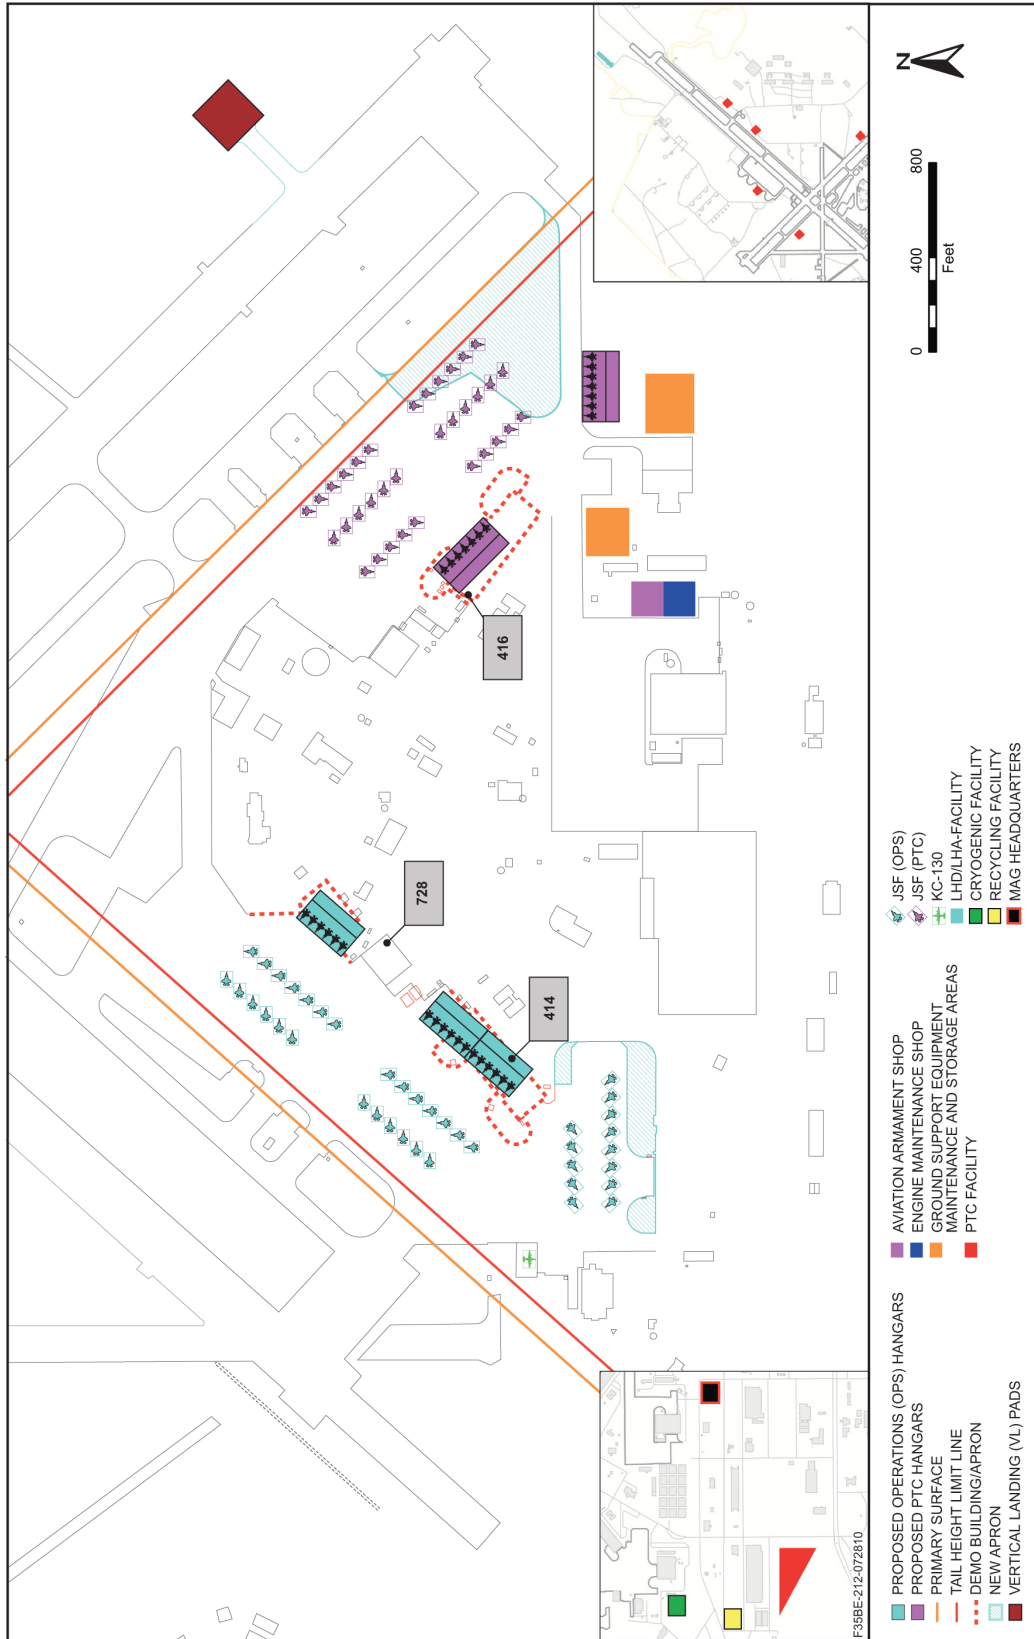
provides the site layouts for proposed new airfield-associated construction and demolition activities as well as proposed sites for support facility construction (USMC 2009d). Under this alternative, 80.1 acres would be disturbed, of which 58.6 acres are currently forested.
